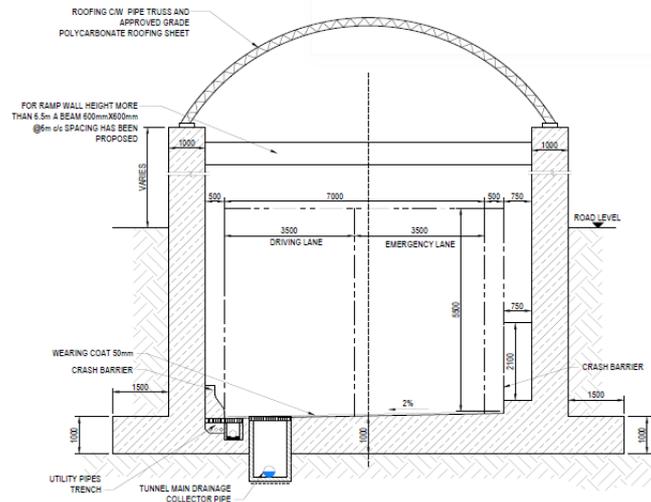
Typical Cross Section RAMP Structure (2 LANE)
